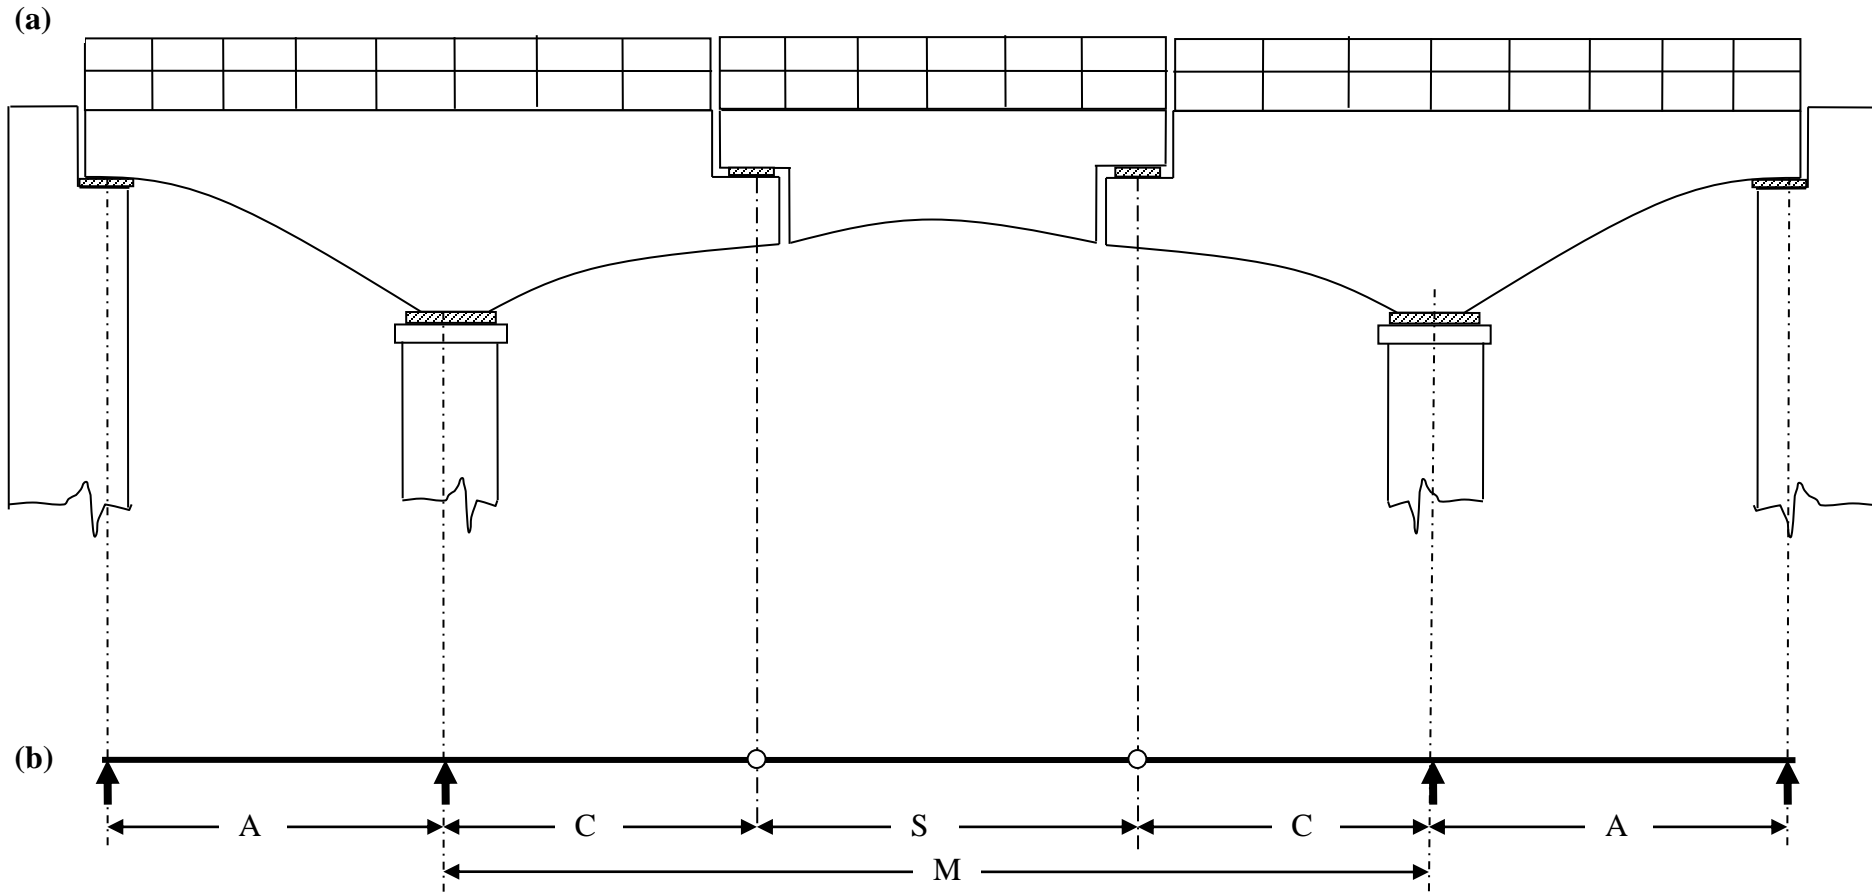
(a) Elevation of the bridge (b) Line diagram of a girder of the bridge
